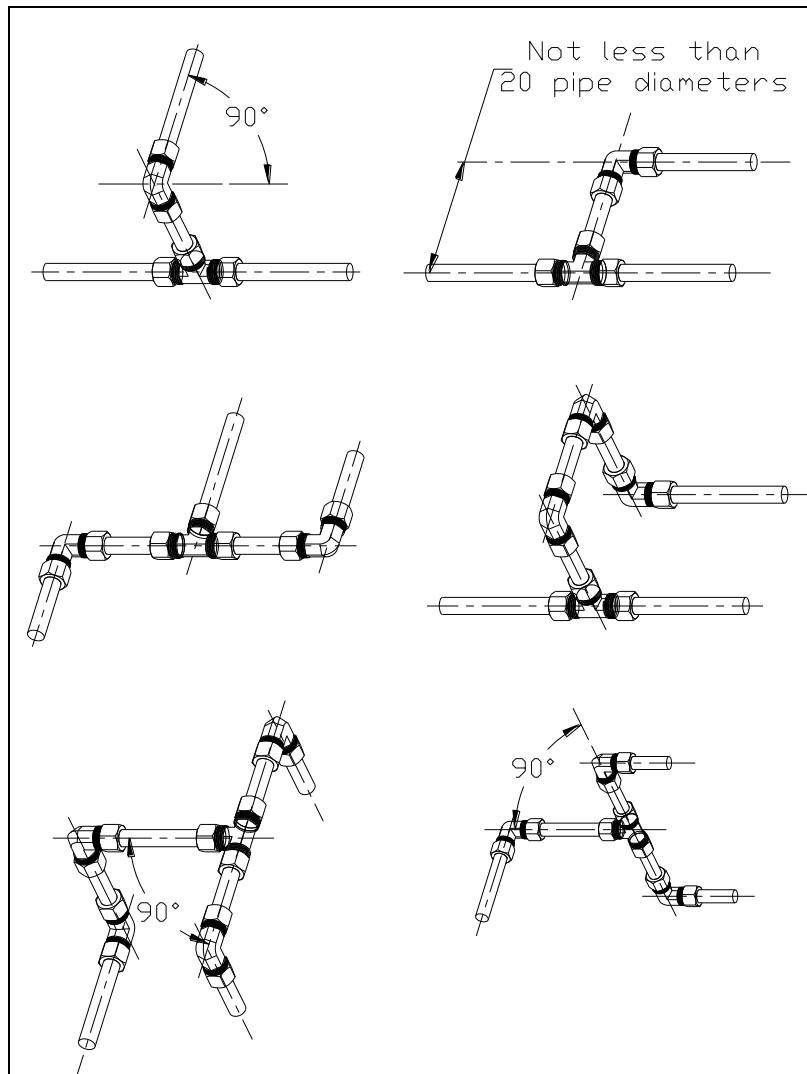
Illustrations of Acceptable Means of Piping Into a Tee in a Dry Powder System
